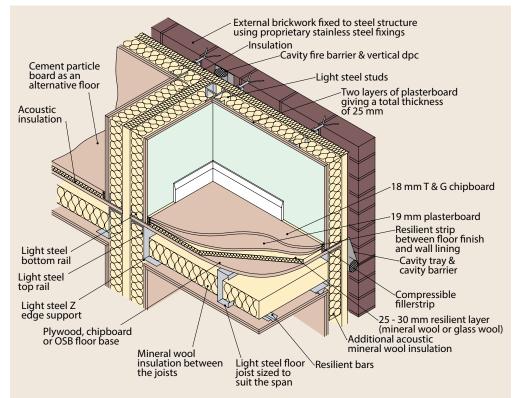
Details of compartment floor at junction with external wall and separating wall
